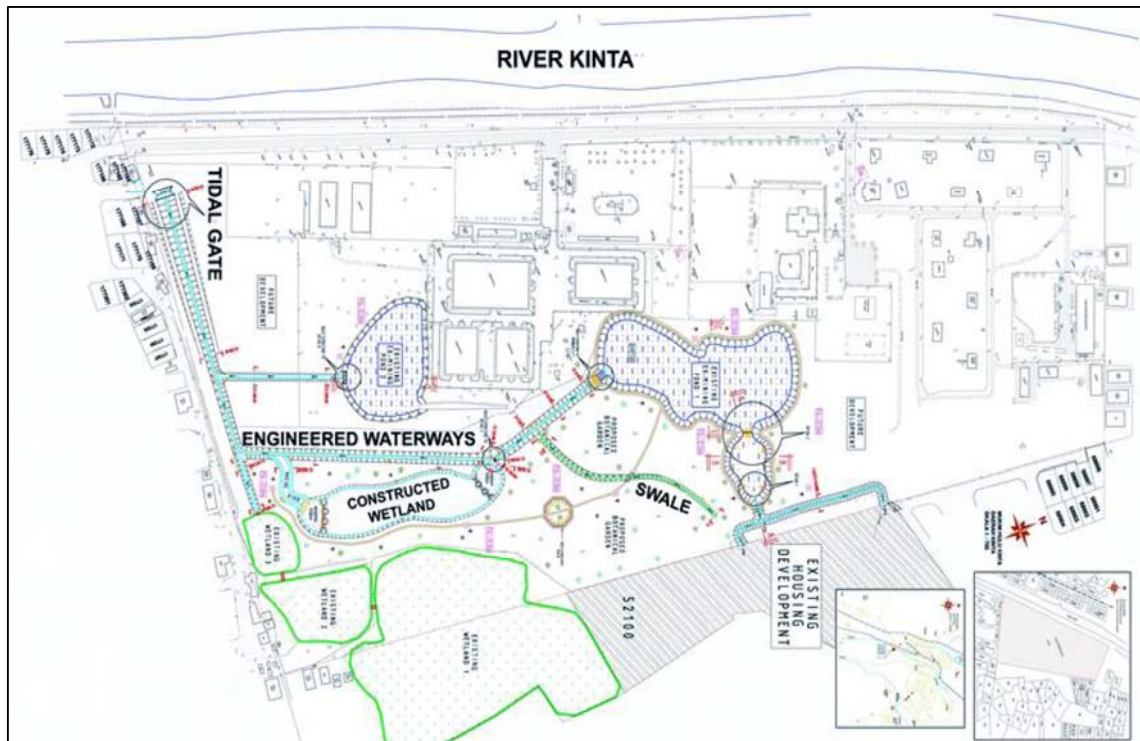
Layout and details of the stormwater facilities proposed in the study area.
